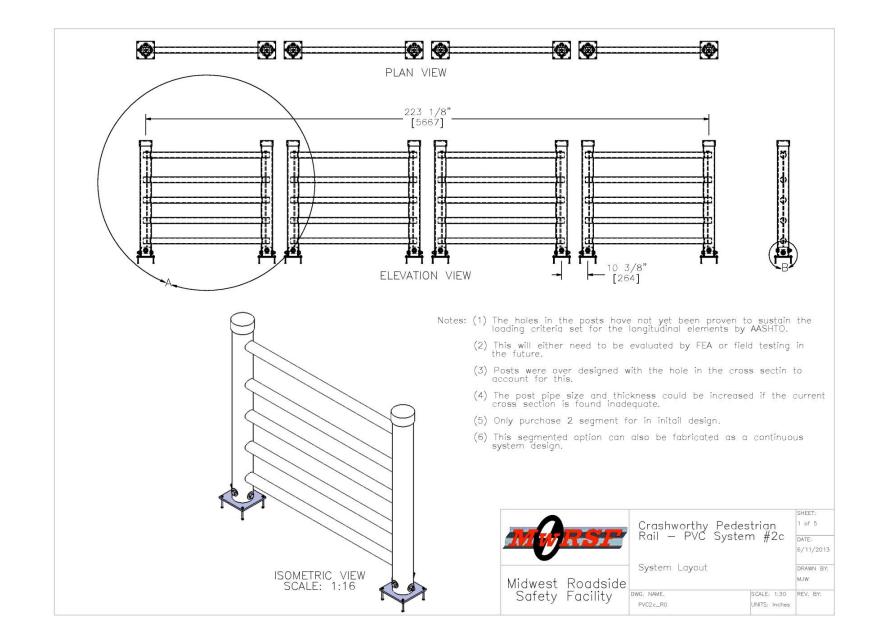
Modular PVC Rail, Design Concept PVC2-c (Sheet 1 of 5)
